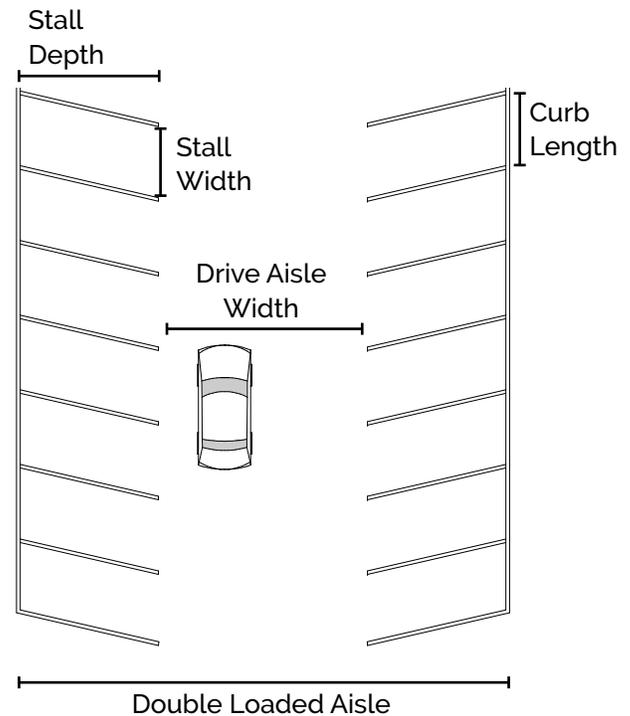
Parking Space and Drive Aisle Dimensions.
